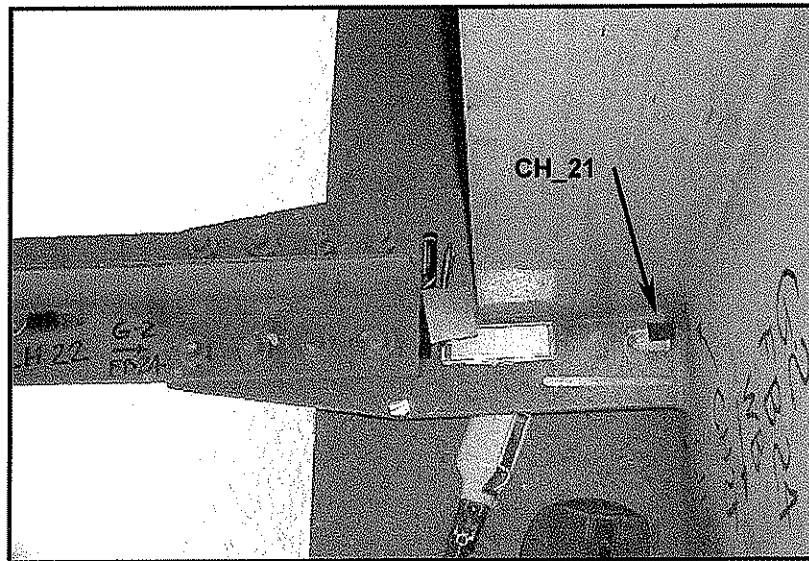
Photographs showing orientation of channels CH_21 located on gusset plate at floorbeam 24 at girder G2
